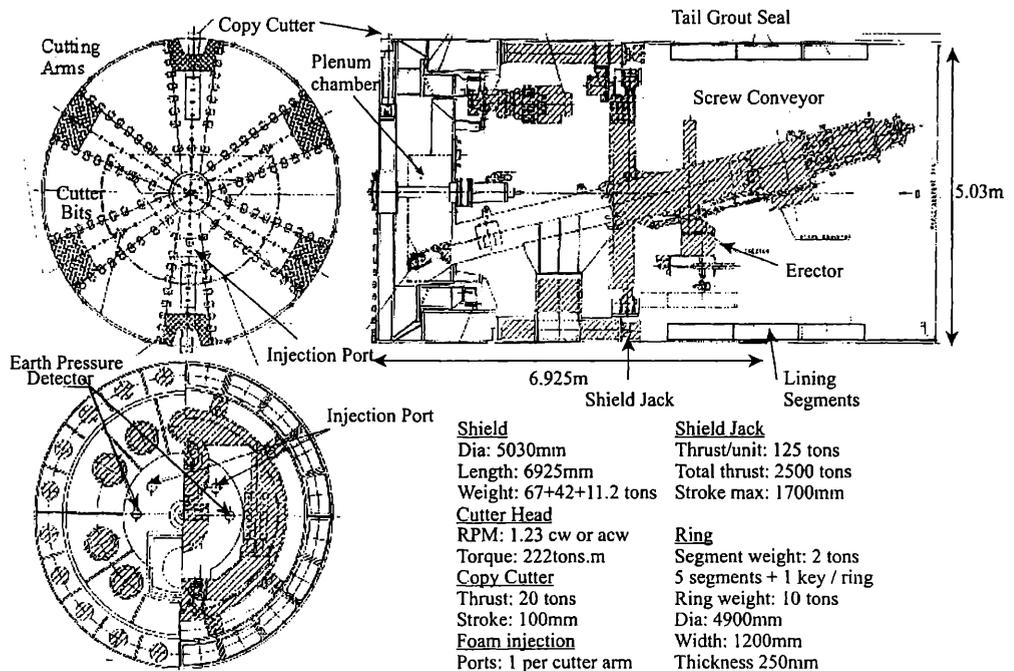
Details of the Kawasaki EPB machine used to tunnel beneath Southwark Park greenfield site
